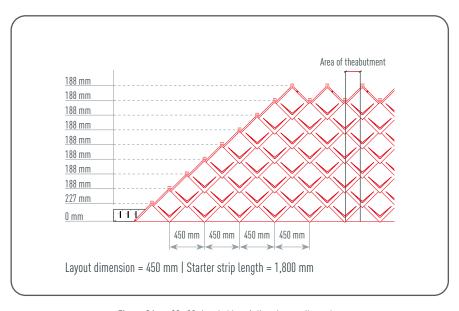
• 29×29 rhomboid roof tile – layout dimension
